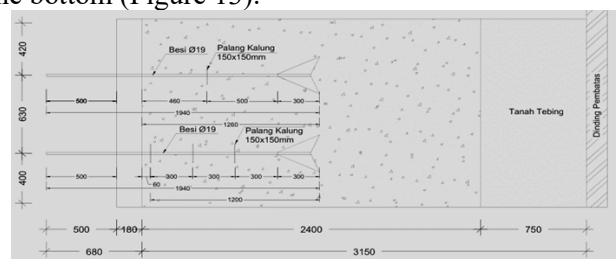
Stage 2 anchor iron installation scheme (designed by the authors)
